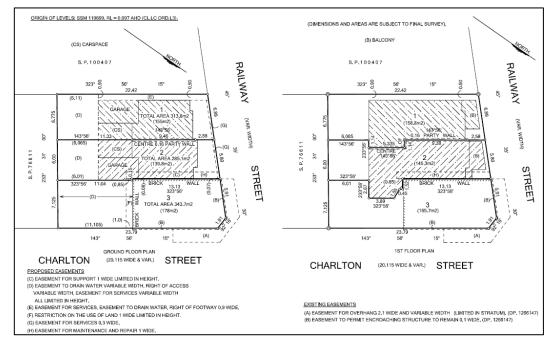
Proposed subdivision plan and easements - ground floor and first floor
